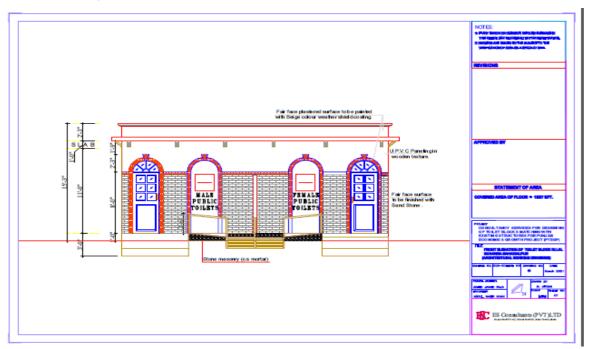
3D elevation view of the proposed toilet block at Lal Suhanra
